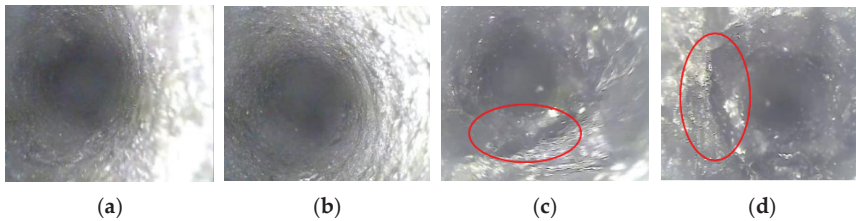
Deformation of surrounding rock during roadway excavation.
